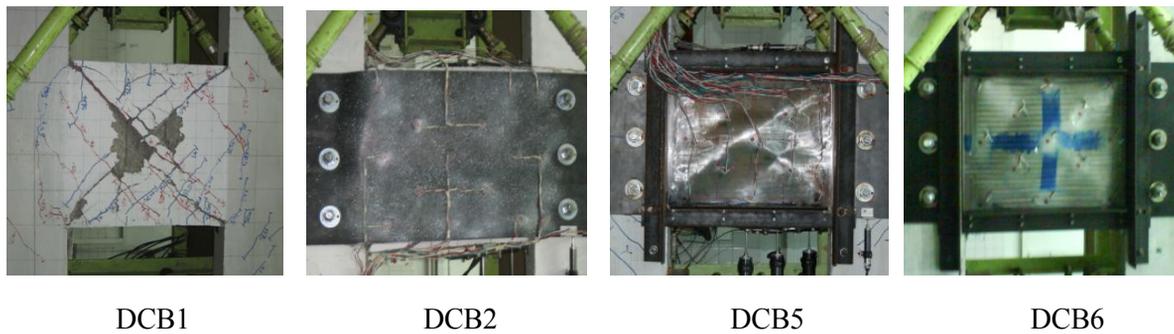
Concrete crack pattern and buckling modes after the tests
